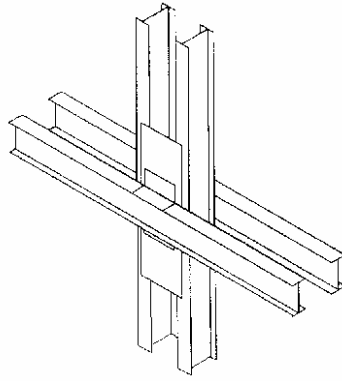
Typical Khorjinee beam-to-column connection used in Iran (after Nateghi, 1995).
